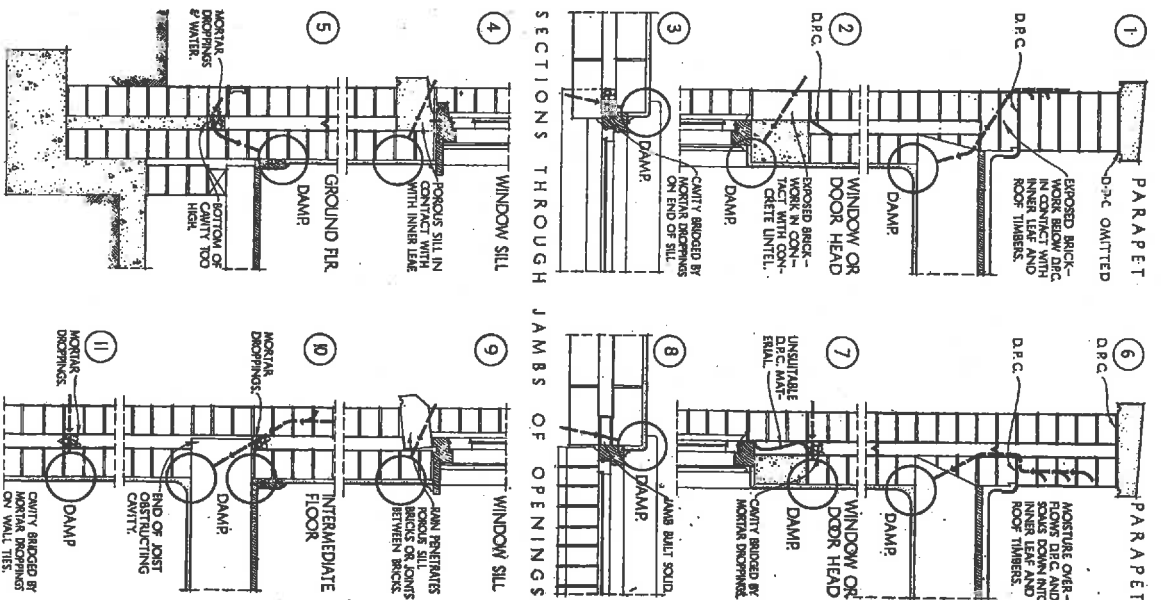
BAD CONSTRUCTIONAL DETAILS FOR CAVITY WALLS
